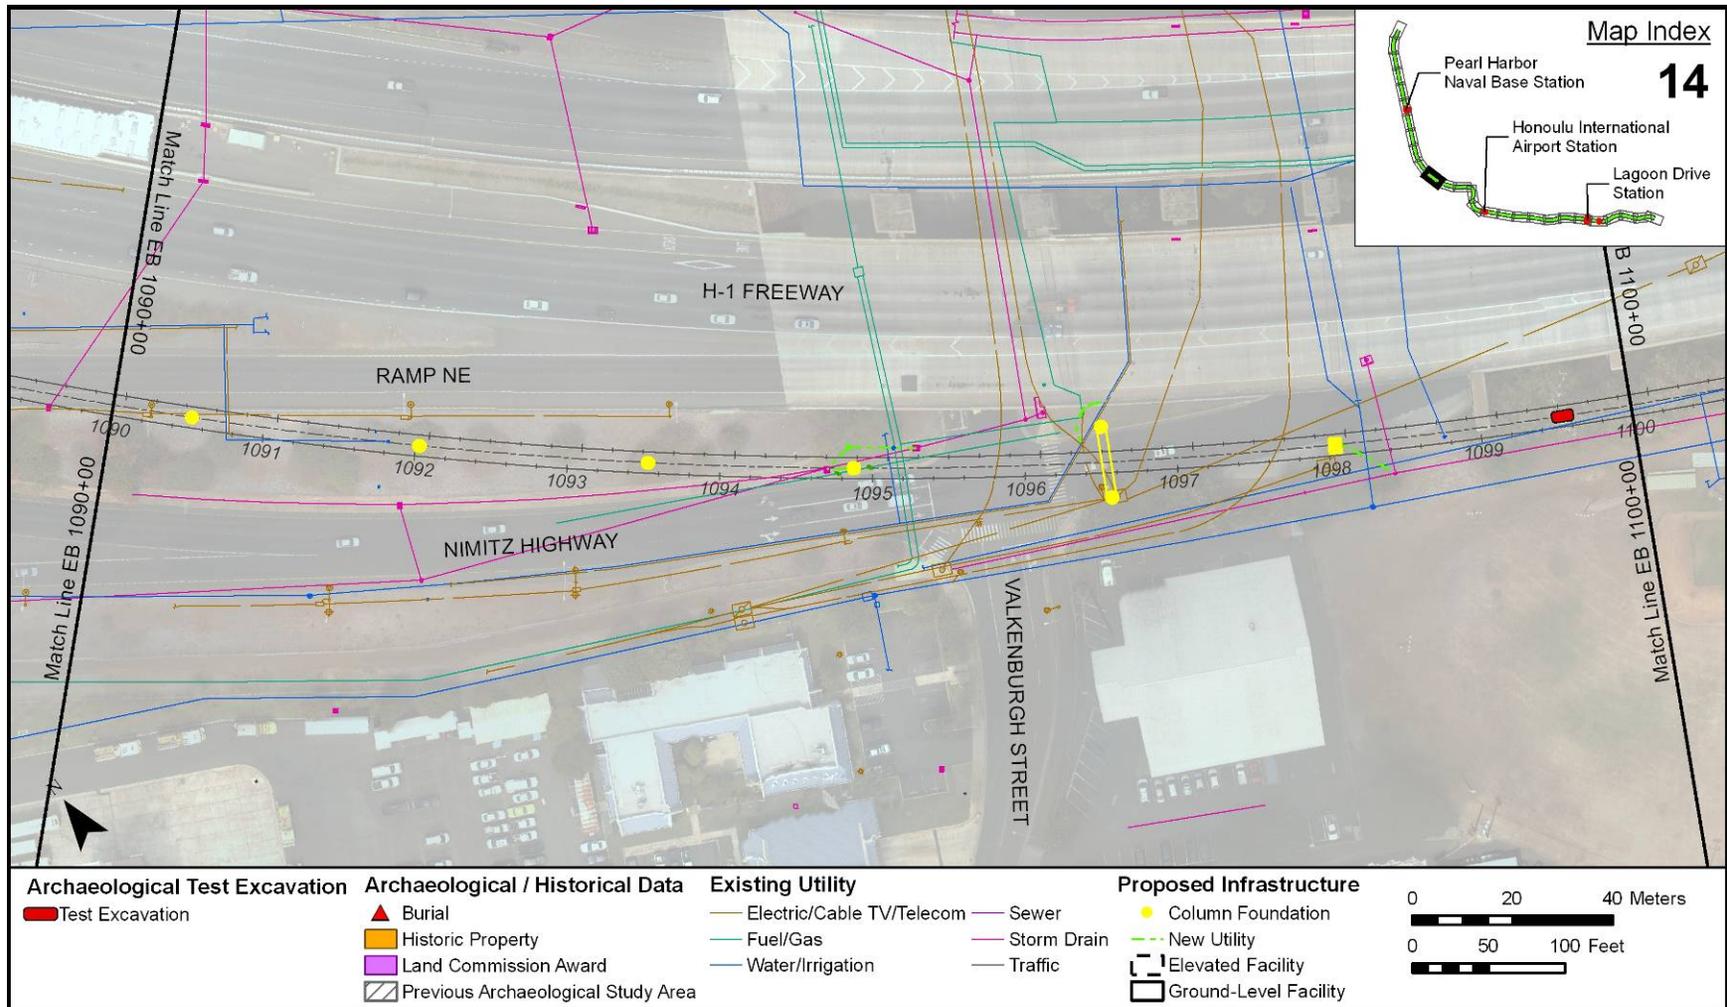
Map Sheet J 14, one 10x3 excavation at column foundation @ 1099+50
